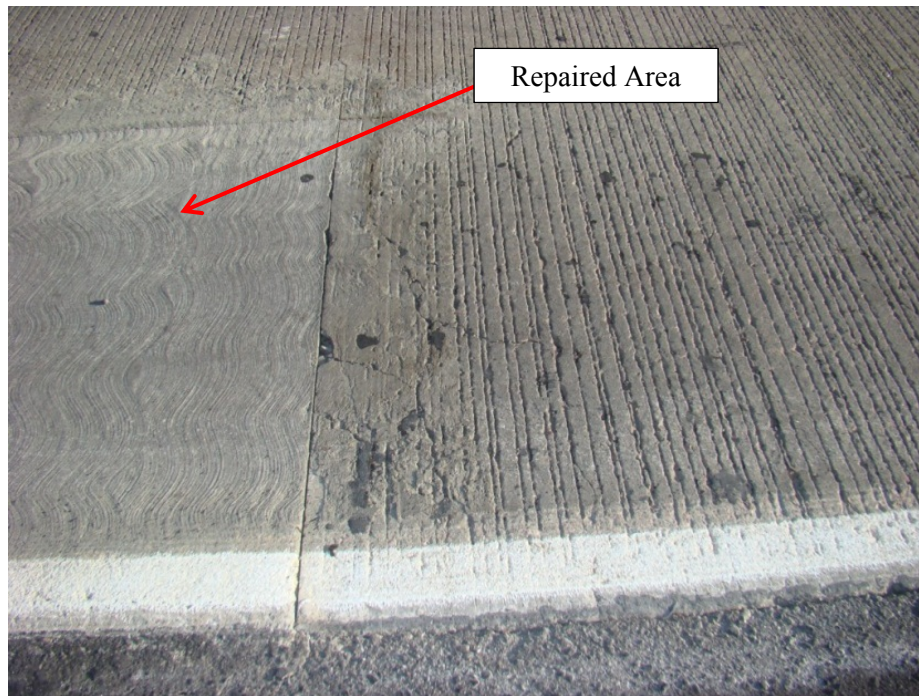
Spalling and transverse cracking close to a repaired section
